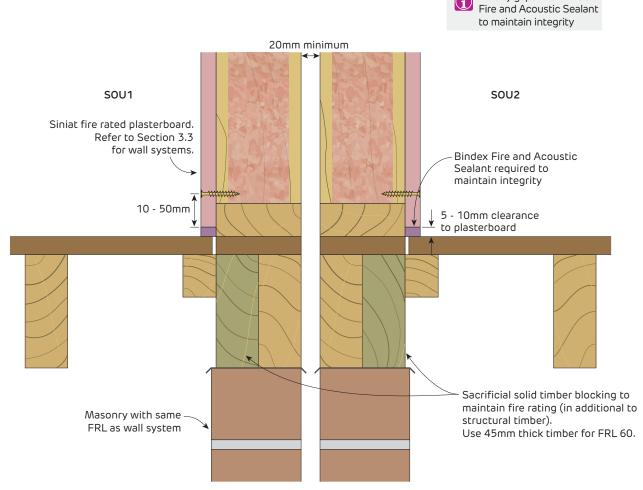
Separating Wall with Suspended Ground Floor FRL 60/60/60 Section
